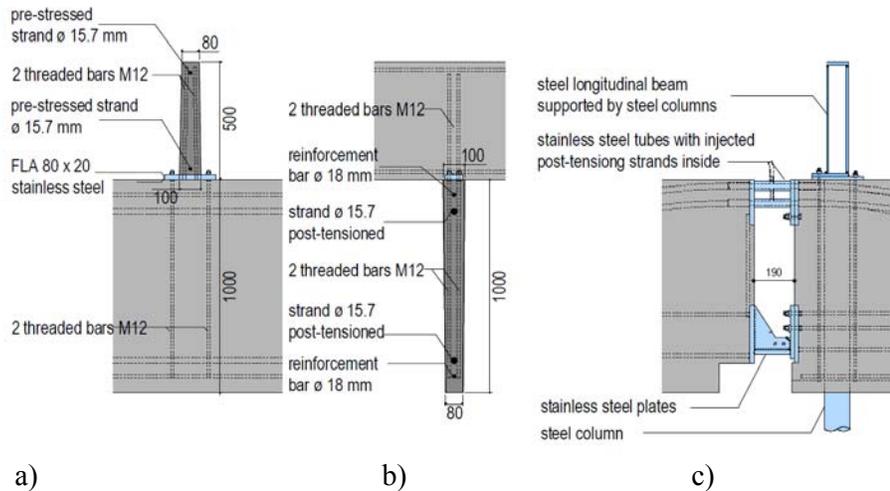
a) and b) detail of joint between longitudinal and lower transversal beams and c) detail of thermic joint and of the suspension of transverse beams to the steel beams
